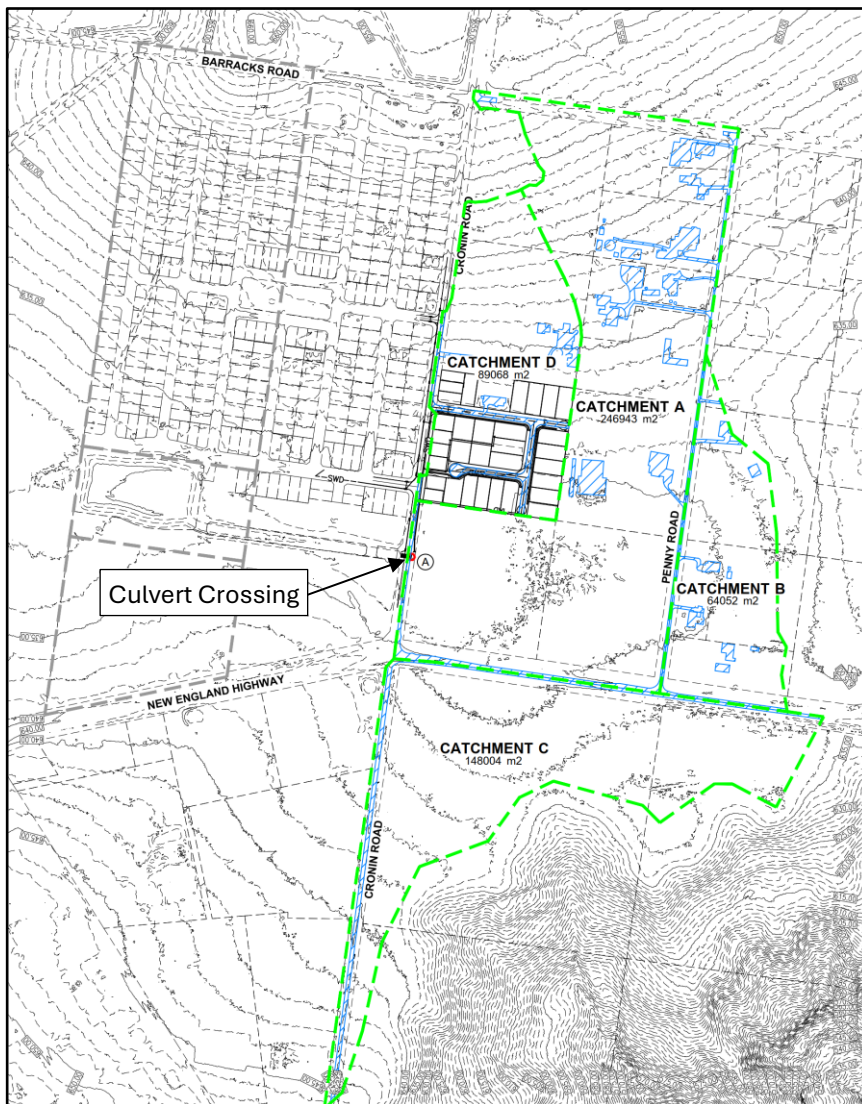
POST-DEVELOPED STORMWATER CATCHMENT PLAN
